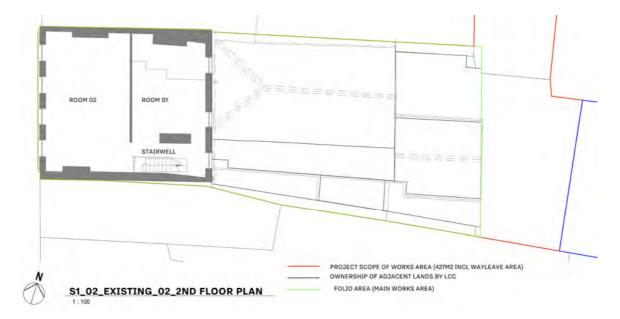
Existing Survey at Second Floor level -refer to Appendix H
